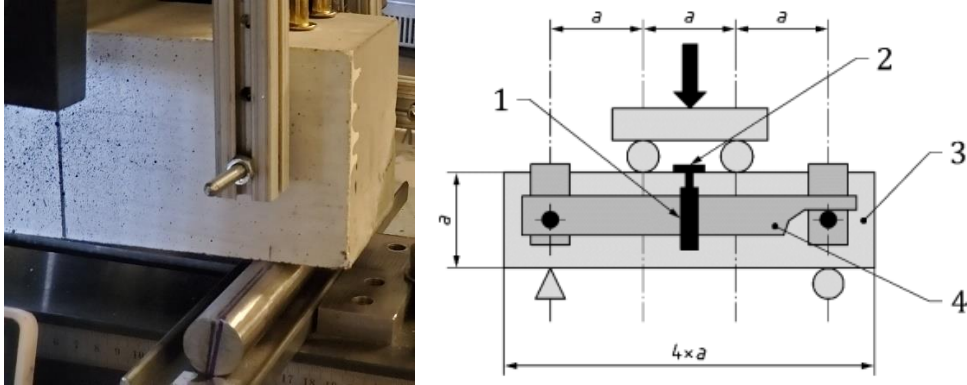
(Left to right): (a) Placement of instrumentation frame on prism specimens. (b) Third point loading illustration.
